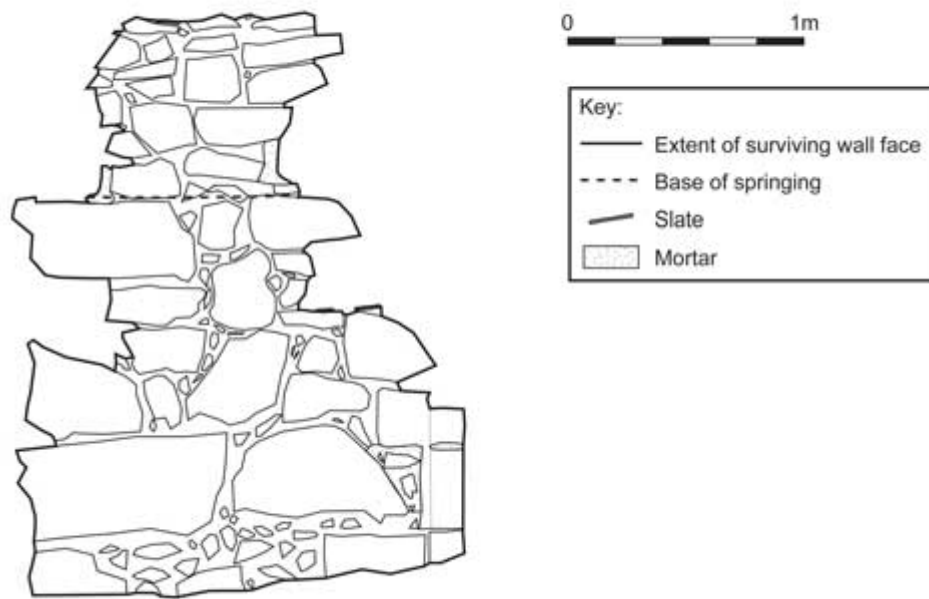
; Structure 5, Rusticated Arch: Elevation c
